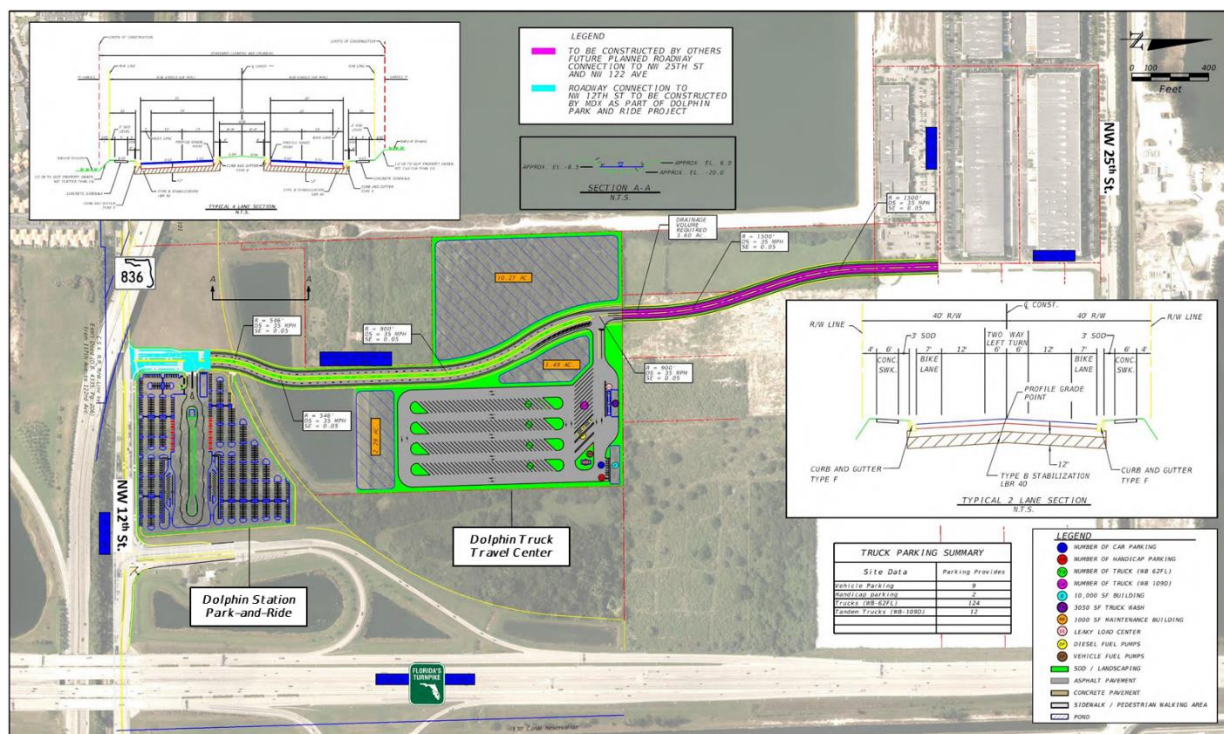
Dolphin Station Park-and-Ride and Dolphin Truck Travel Center Recommended Layout
